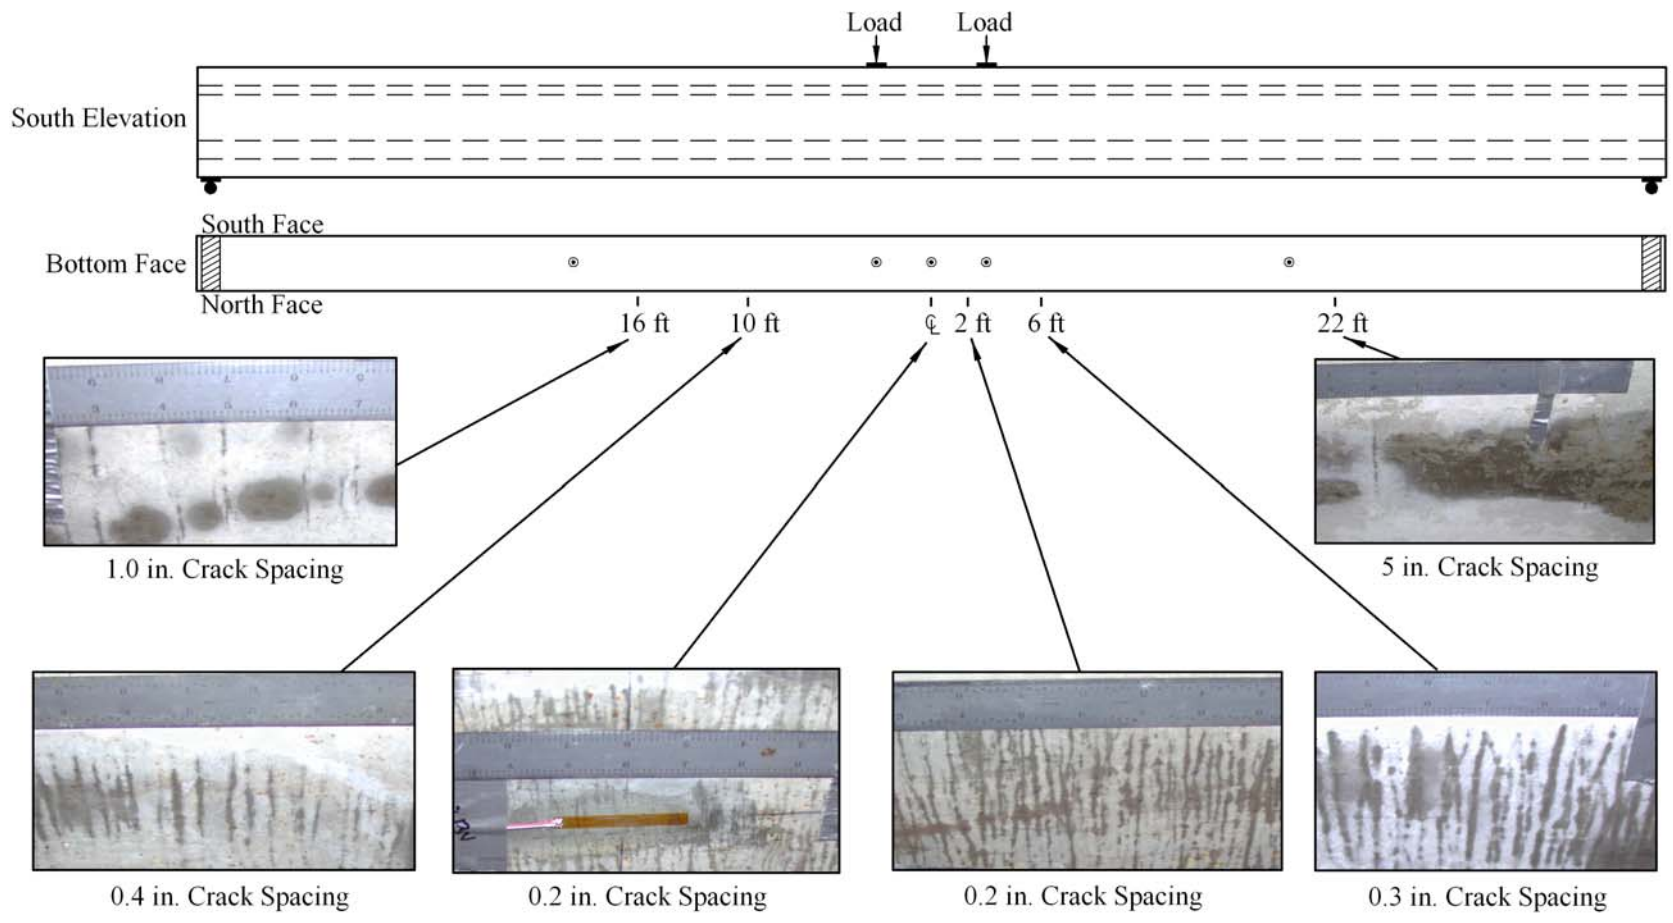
H: Crack spacing on the bottom flange of Girder 80F at 12 in. midspan overall girder deflection
